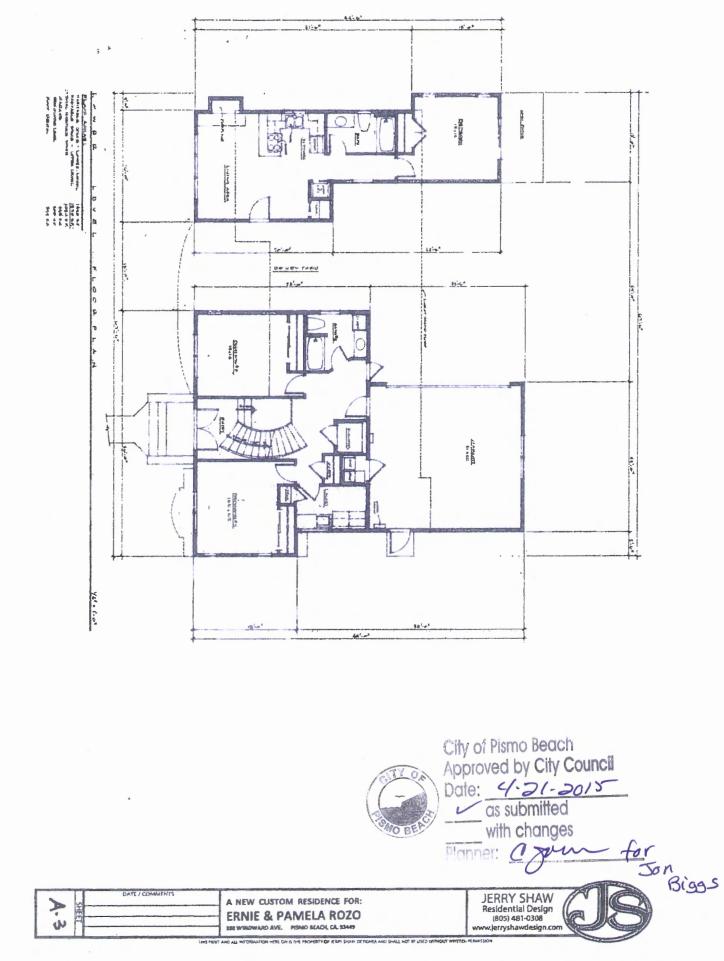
Proposed Project Plans A-3-PSB-15-0030 (Rozo SFD) Page 3 of 9
